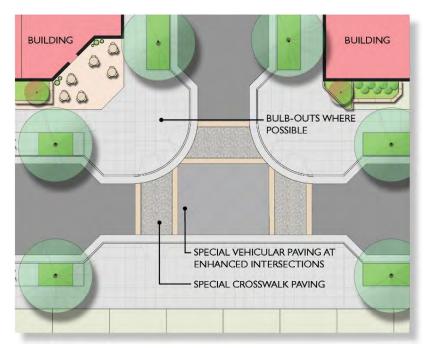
Bulb-Outs and Sidewalk Scoring Pattern
